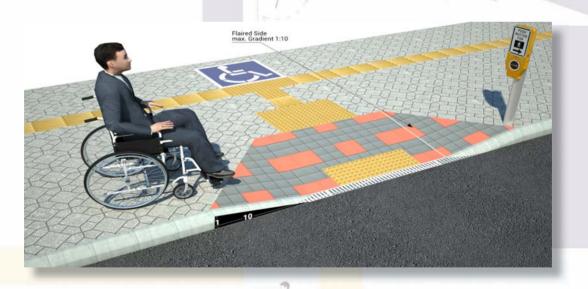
Kerb Extension at Street & Ramp Requirements Intersection
